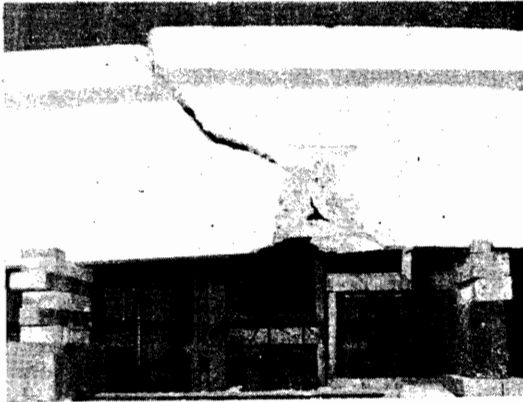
RECTANGULAR BEAM SPECIMENS AFTER FAILURE
